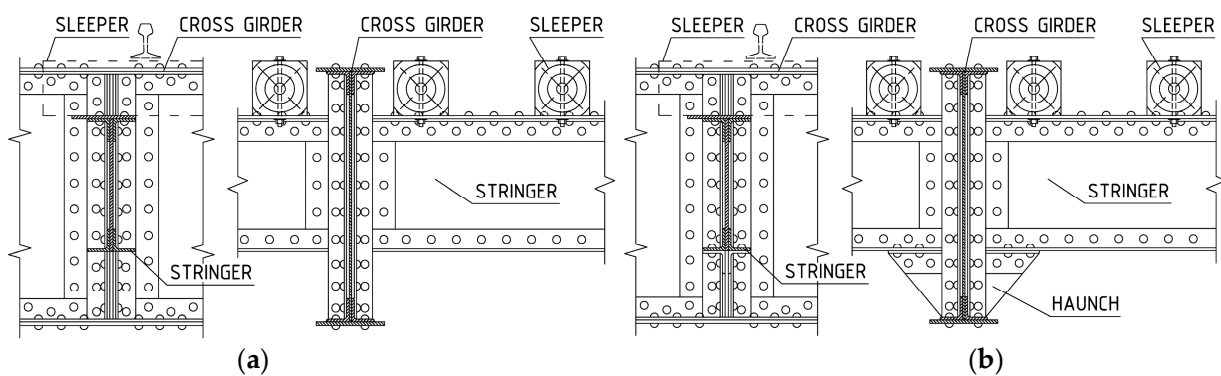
Arrangement of a typical stringer-to-cross-girder riveted connection (a) without a reinforcing haunch and (b) with a reinforcing haunch.
